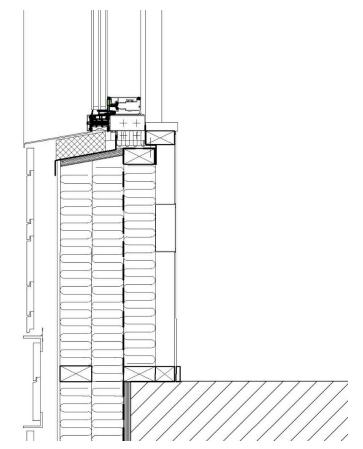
Vertical details under the window. Illustration: Snøhetta.
